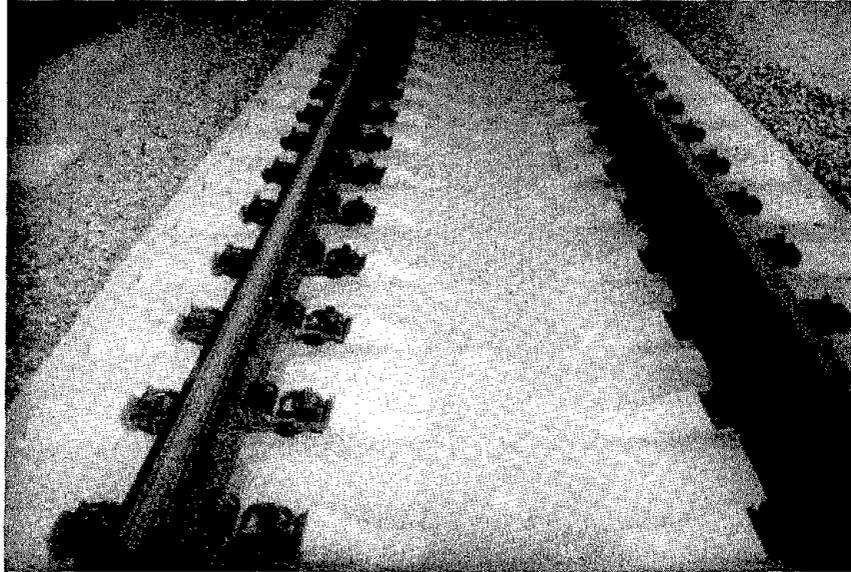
PRECAST CONCRETE SLABS AT KARLSFELD
